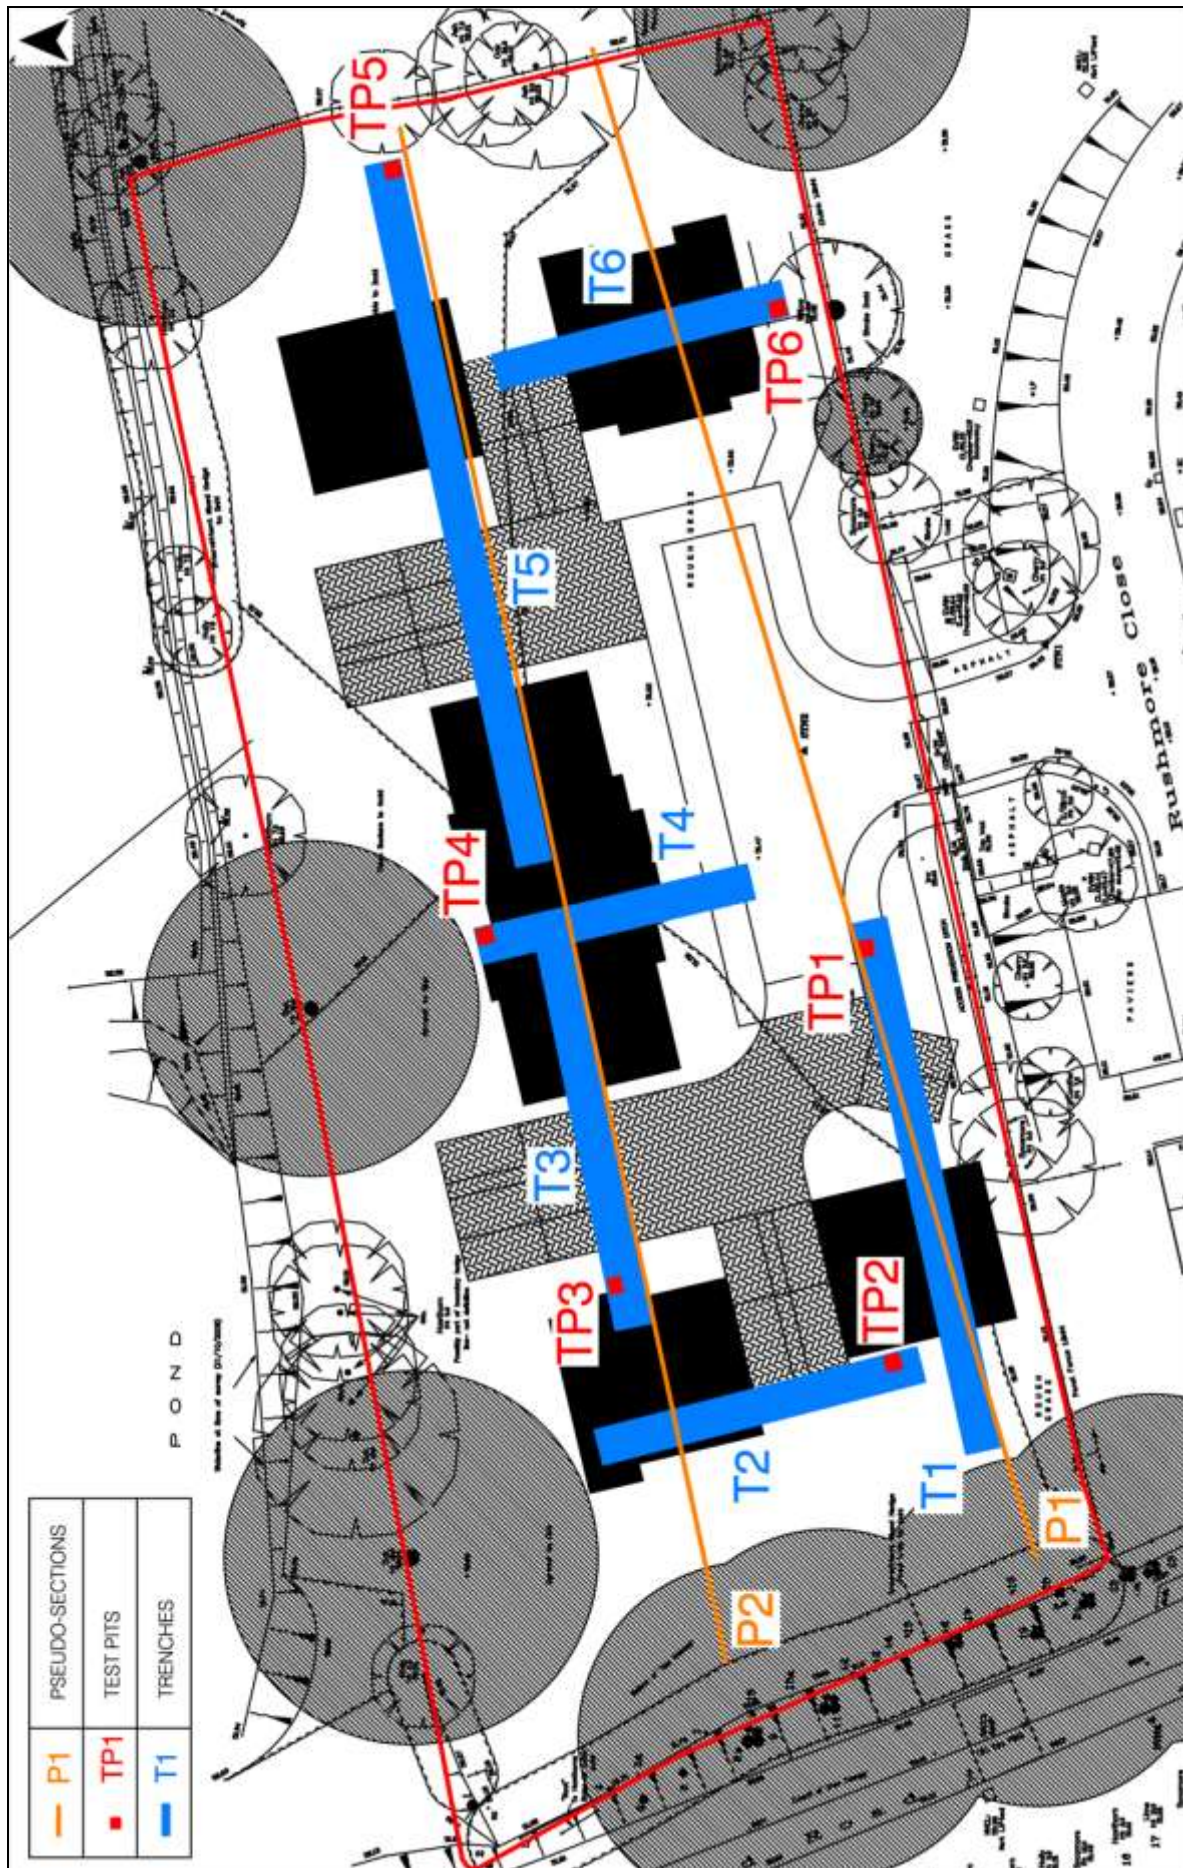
Site plan showing location of archaeological evaluations, tree protection orders (hatched) and proposed development (scale 1:400)
